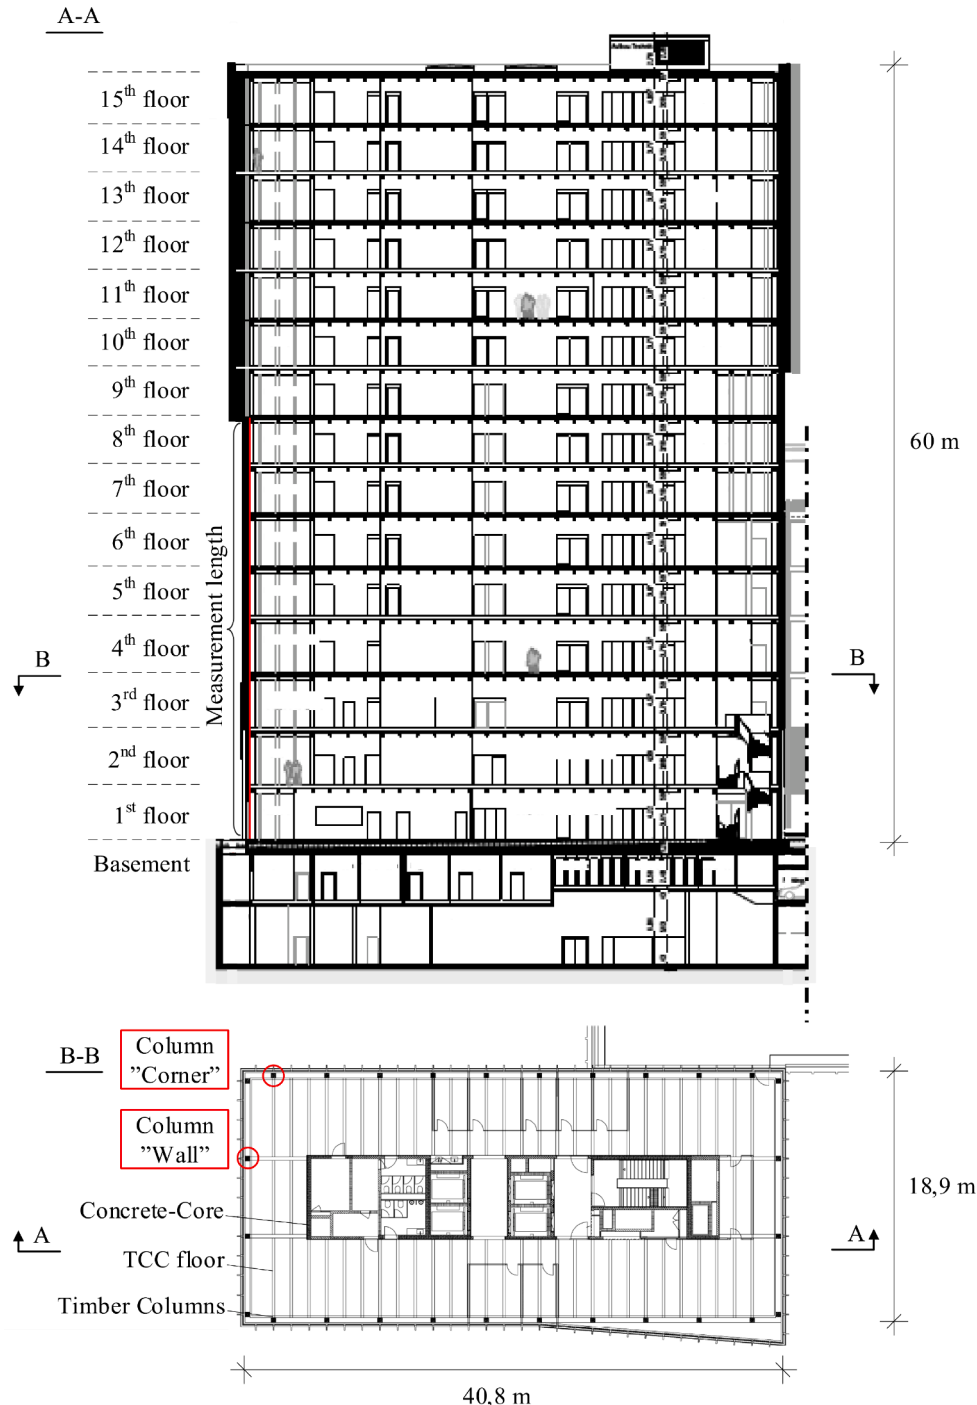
Section of the high-rise building *Arbo* and floor plan of the 4th floor with labelling of examined column positions ("corner" and "wall").
